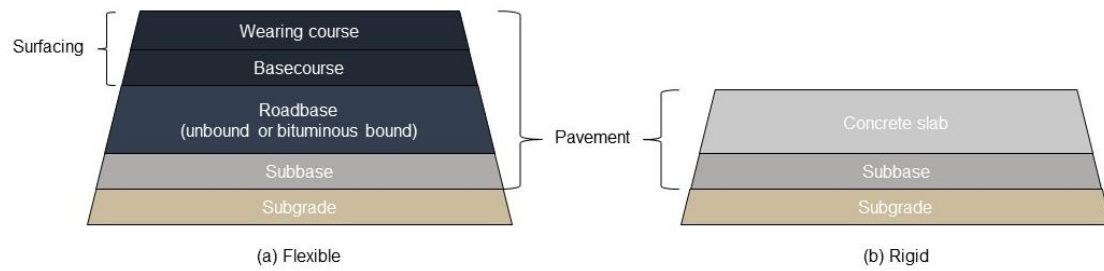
Basic elements of new flexible and rigid pavements (O'Flaherty, 2002)
